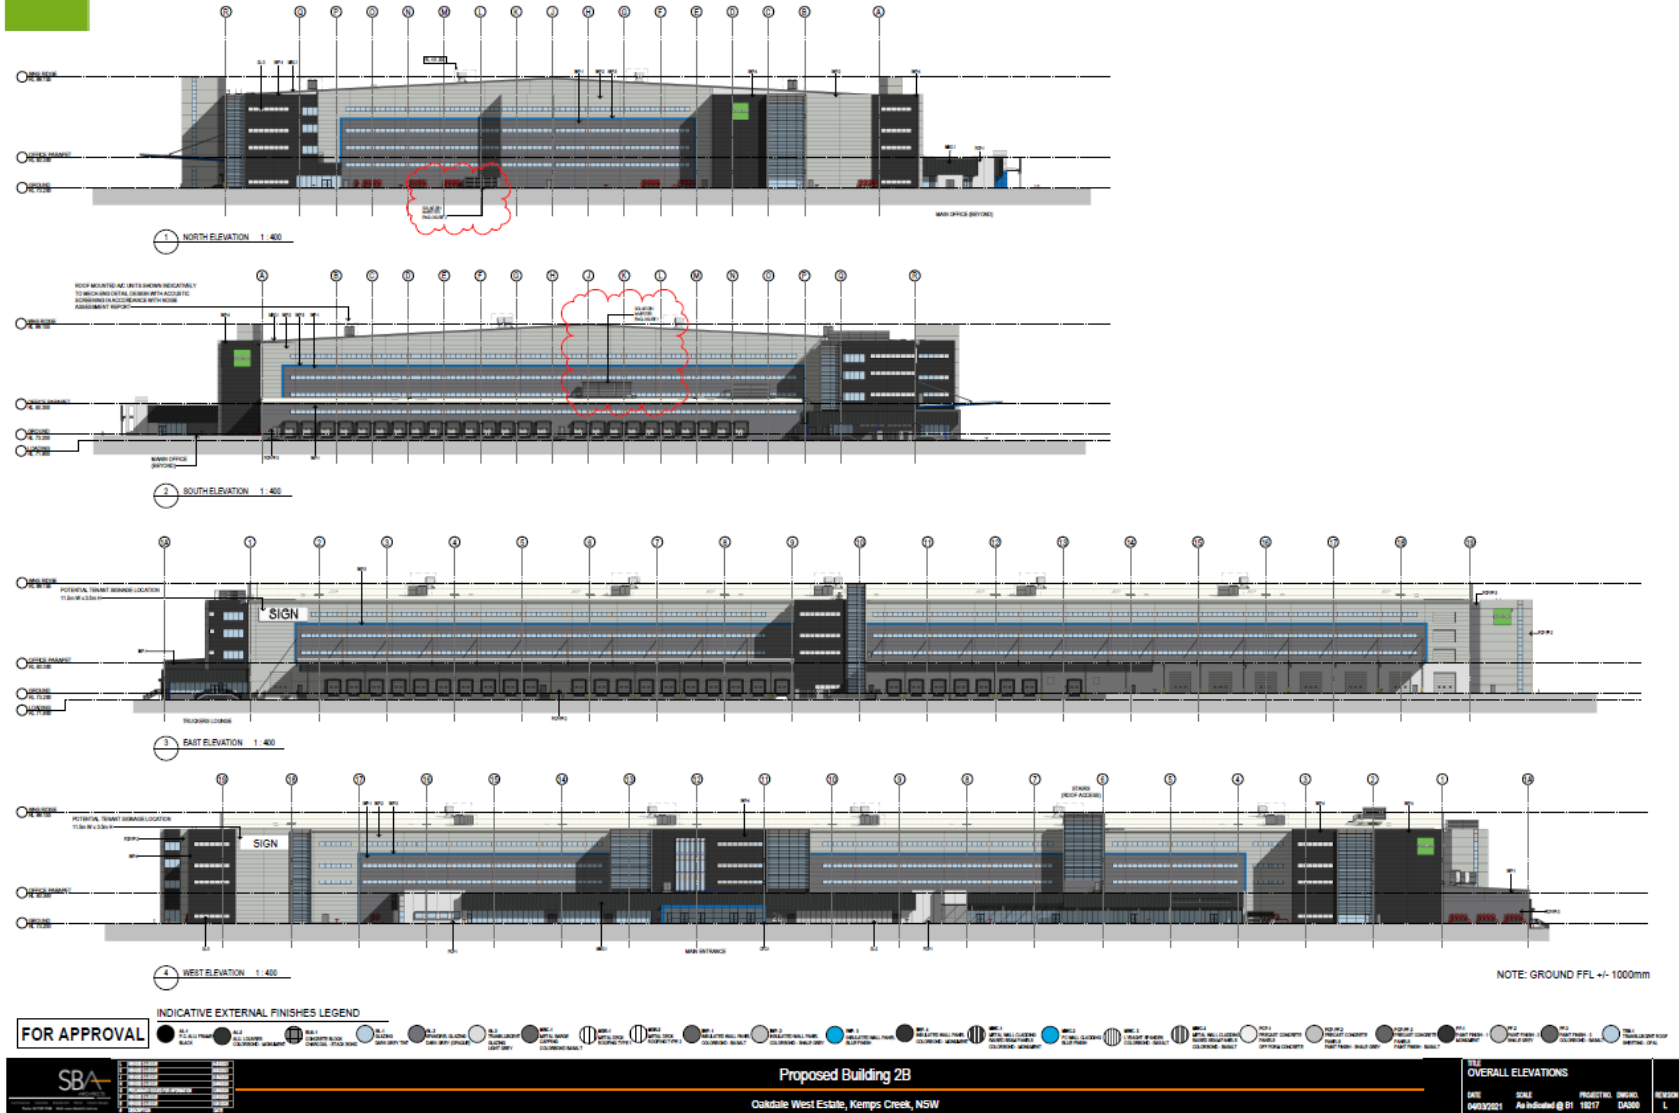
Elevations (Mod 2 – Plan 4 of 4)
